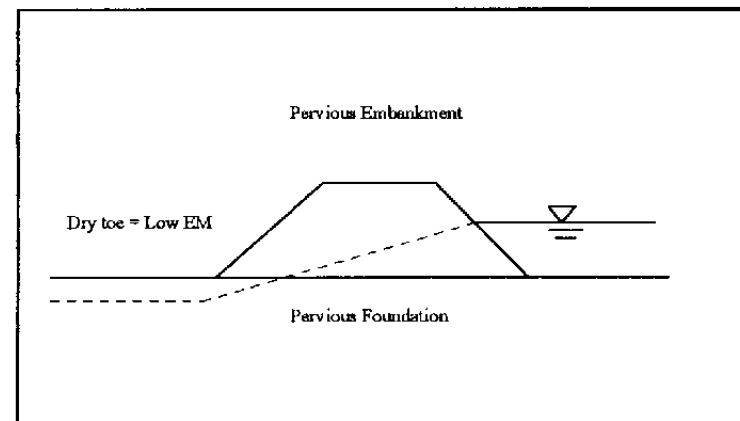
Case 1. Pervious embankment over pervious foundation.
